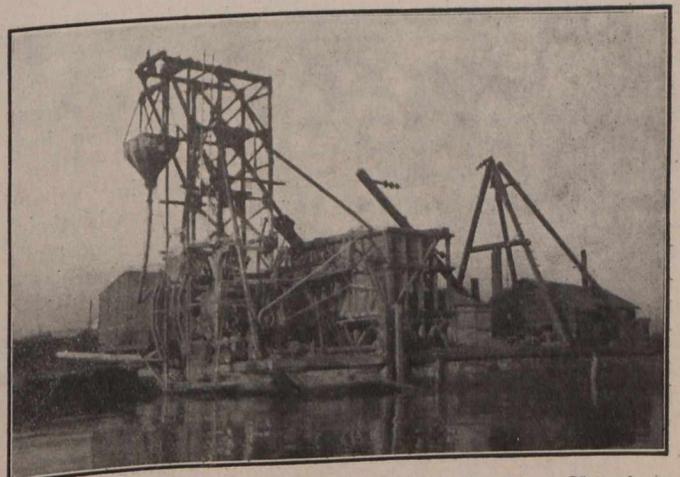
Front View of Concreting Dredge, Showing Elevating Apparatus, Etc.
